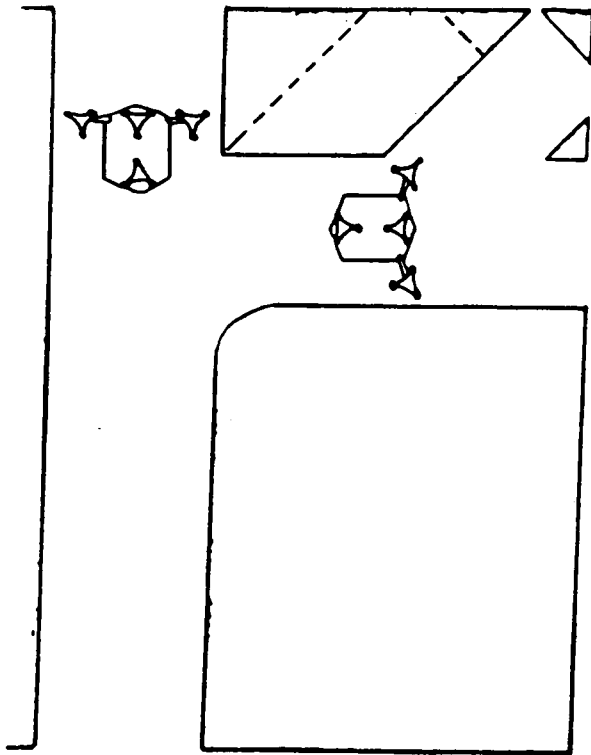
Ground control plan with mobile remote roof support (remotely operated).
